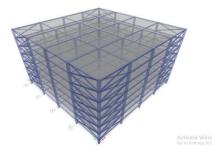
G+6 Building with X-Bracing on outer peripheral Corners
